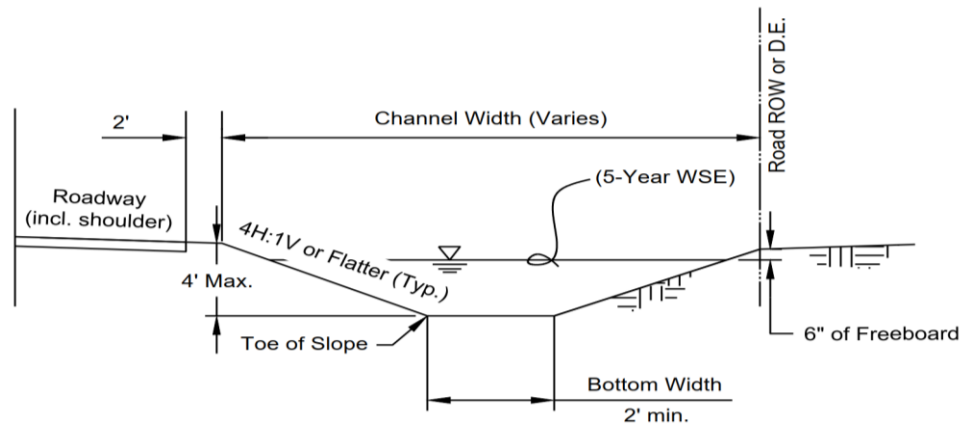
Typical Grass-Lined Trapezoidal Roadside Channel Section
